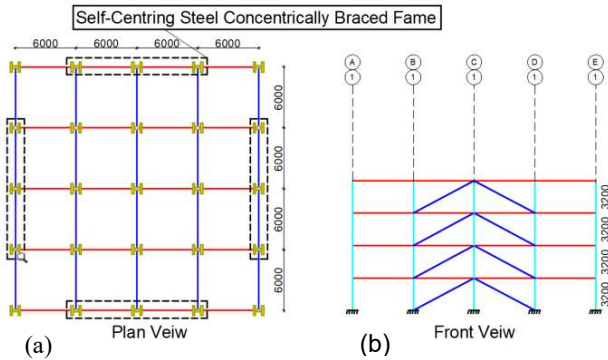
(a) Floor plan of the archetype building of CBF and MRF systems (b) The Elevation view of the CBF building (dimensions in millimetres)
